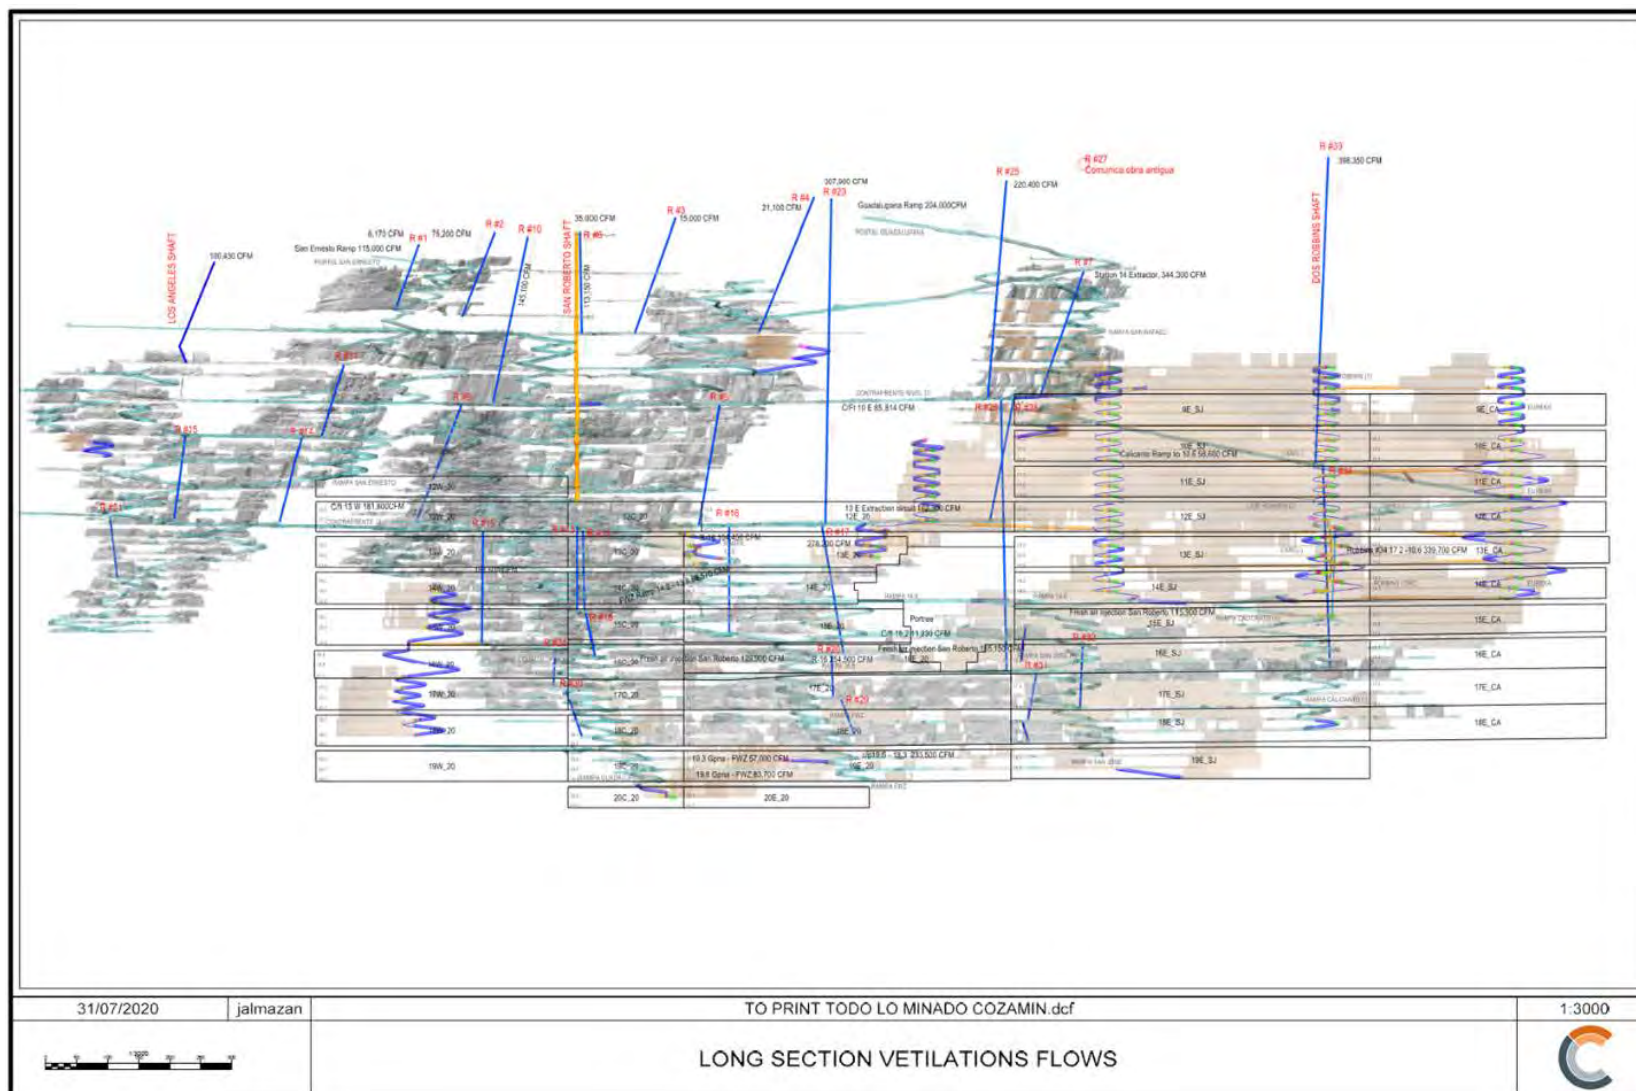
Cozamin Ventilation Network Section, looking to the northeast at 55°
